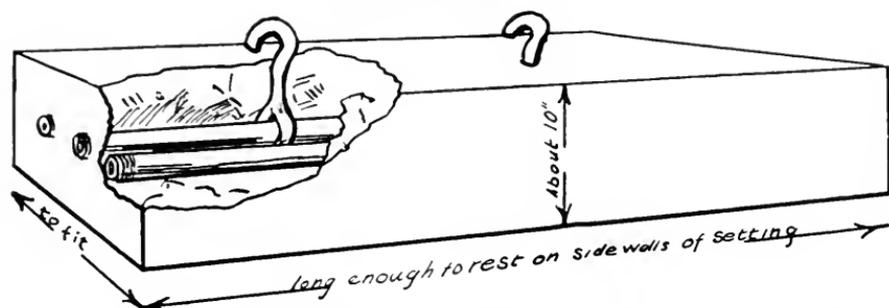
CONCRETE BACK ARCH, FOR HORIZONTAL TUBULAR BOILER. CORNER BROKEN AWAY TO SHOW PIPE REINFORCEMENT.
